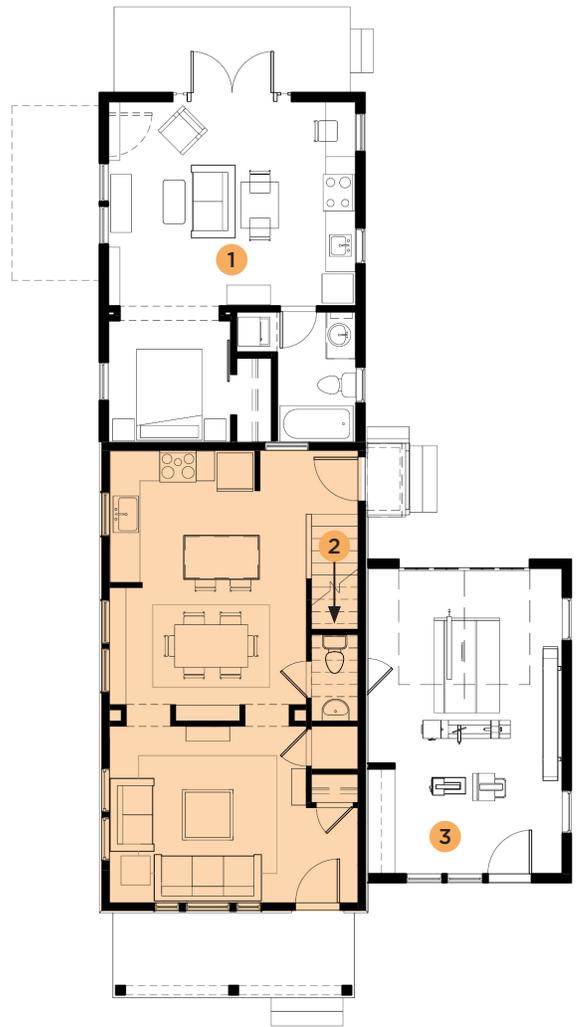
First floor of the base plan (highlighted in orange) with optional additions
